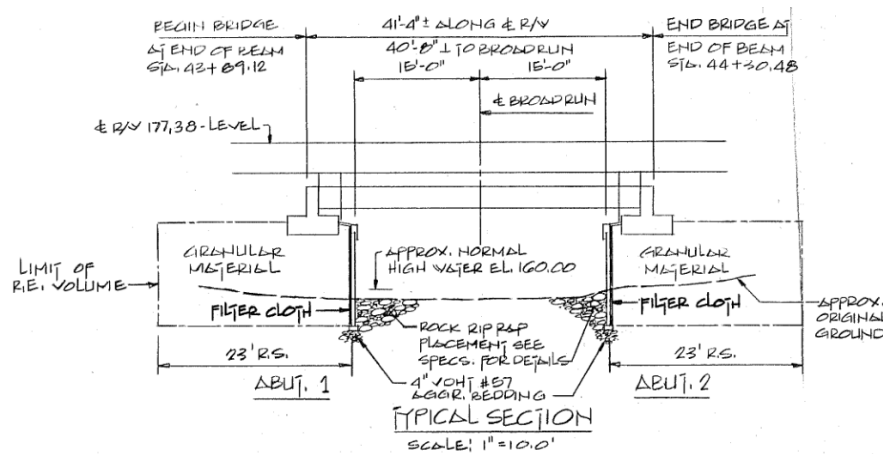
Elevation overview of bridge abutment composition and extent of MSE retaining walls.
